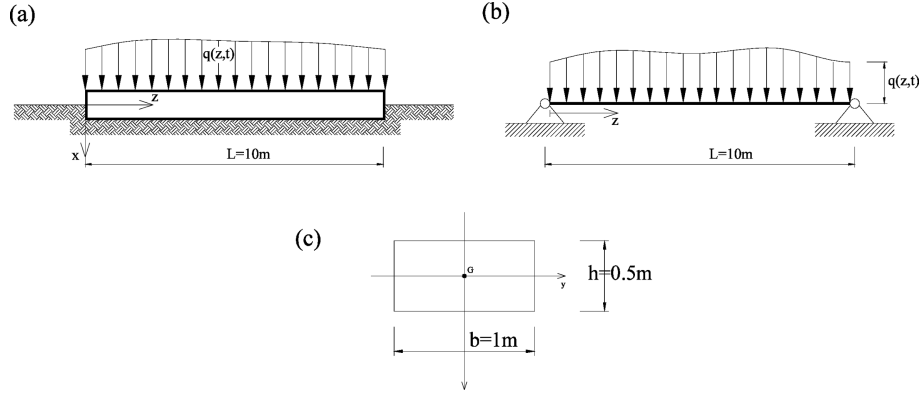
(a) Unrestrained beam, (b) hinged-hinged beam, (c) beam cross section
